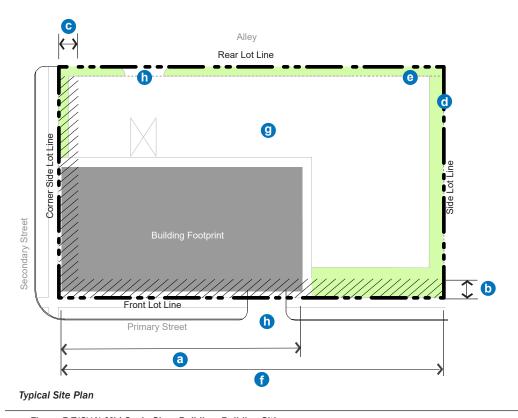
(C)(1) Mid Scale Shop Building: Building Siting
